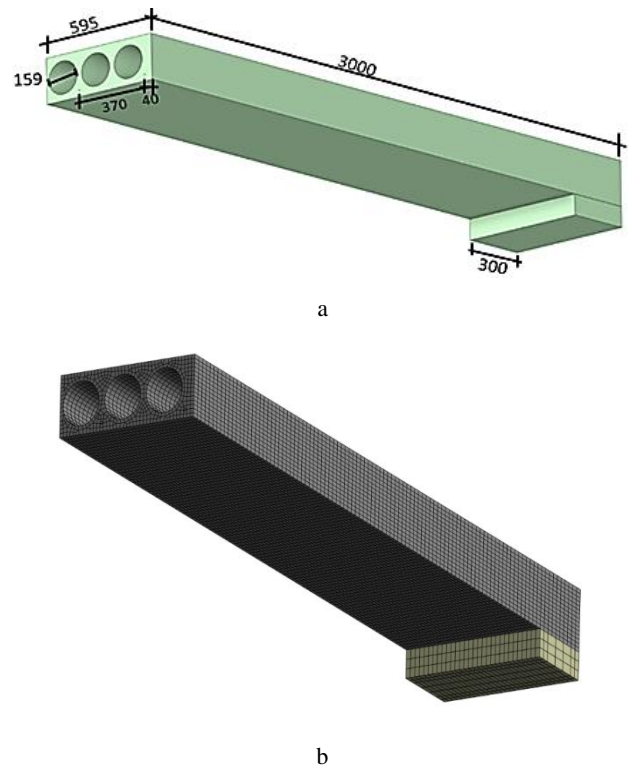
1/4 part of a reinforced concrete hollow core slab in three-dimensional space (a) and its finite element model (b)
